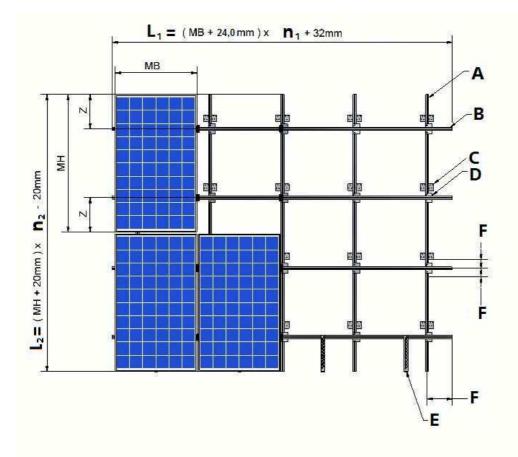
Roof hook connecting rails and carrier rails shown in a two-layer arrangement
